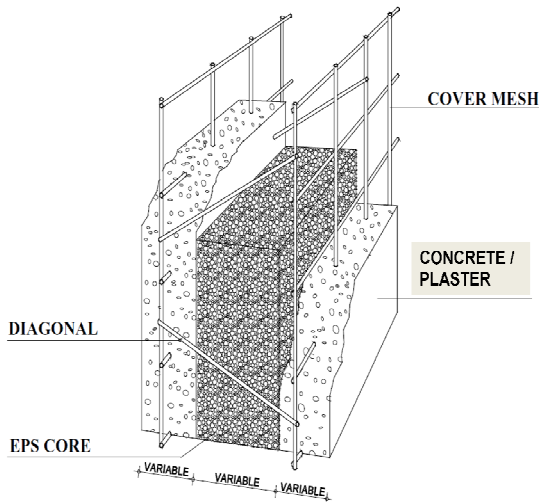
Cross Section of Prefabricated 3D Wall Panel
